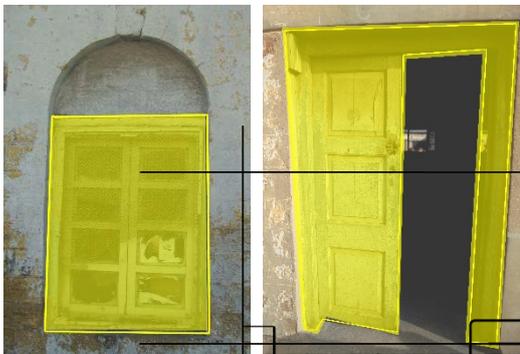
Termite Infestation - Wooden doors, windows on Barrack A and its extension, East Wharf, KPT, Karachi.
